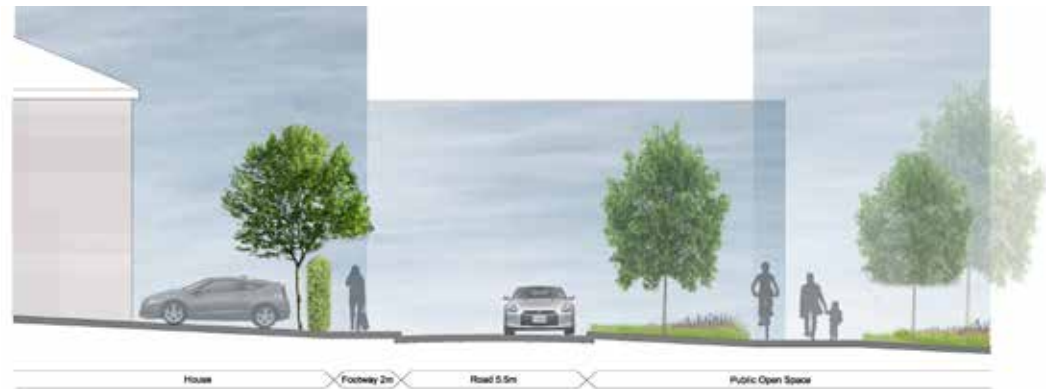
STREET SECTION, PERIPHERAL ROAD
